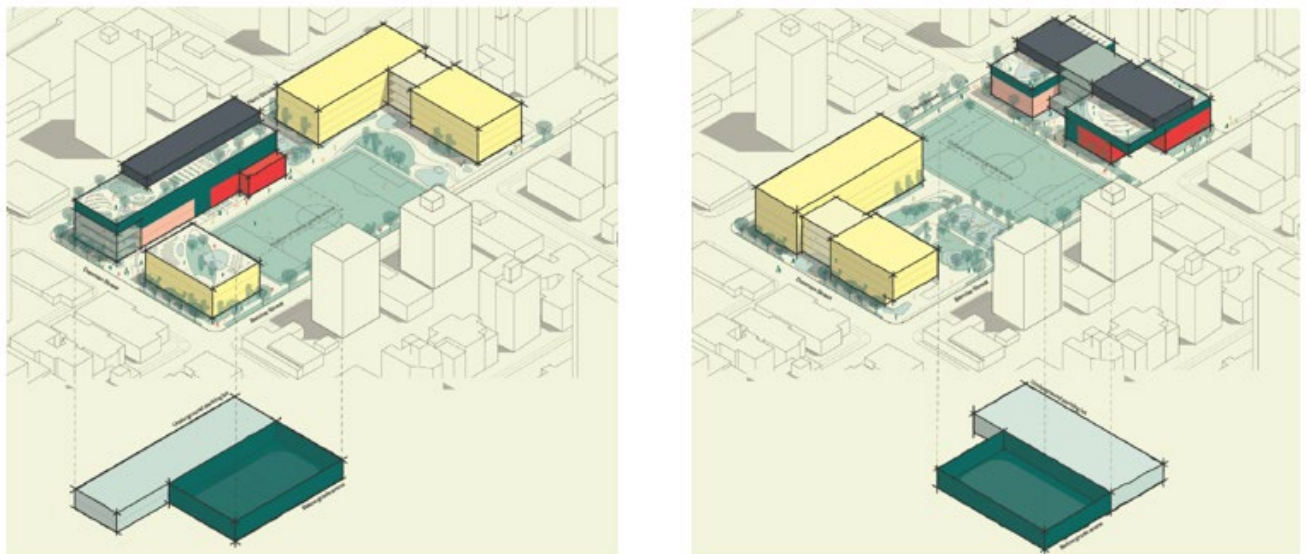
Alternate Plans - colours and massing are not intended to represent building form or design.
